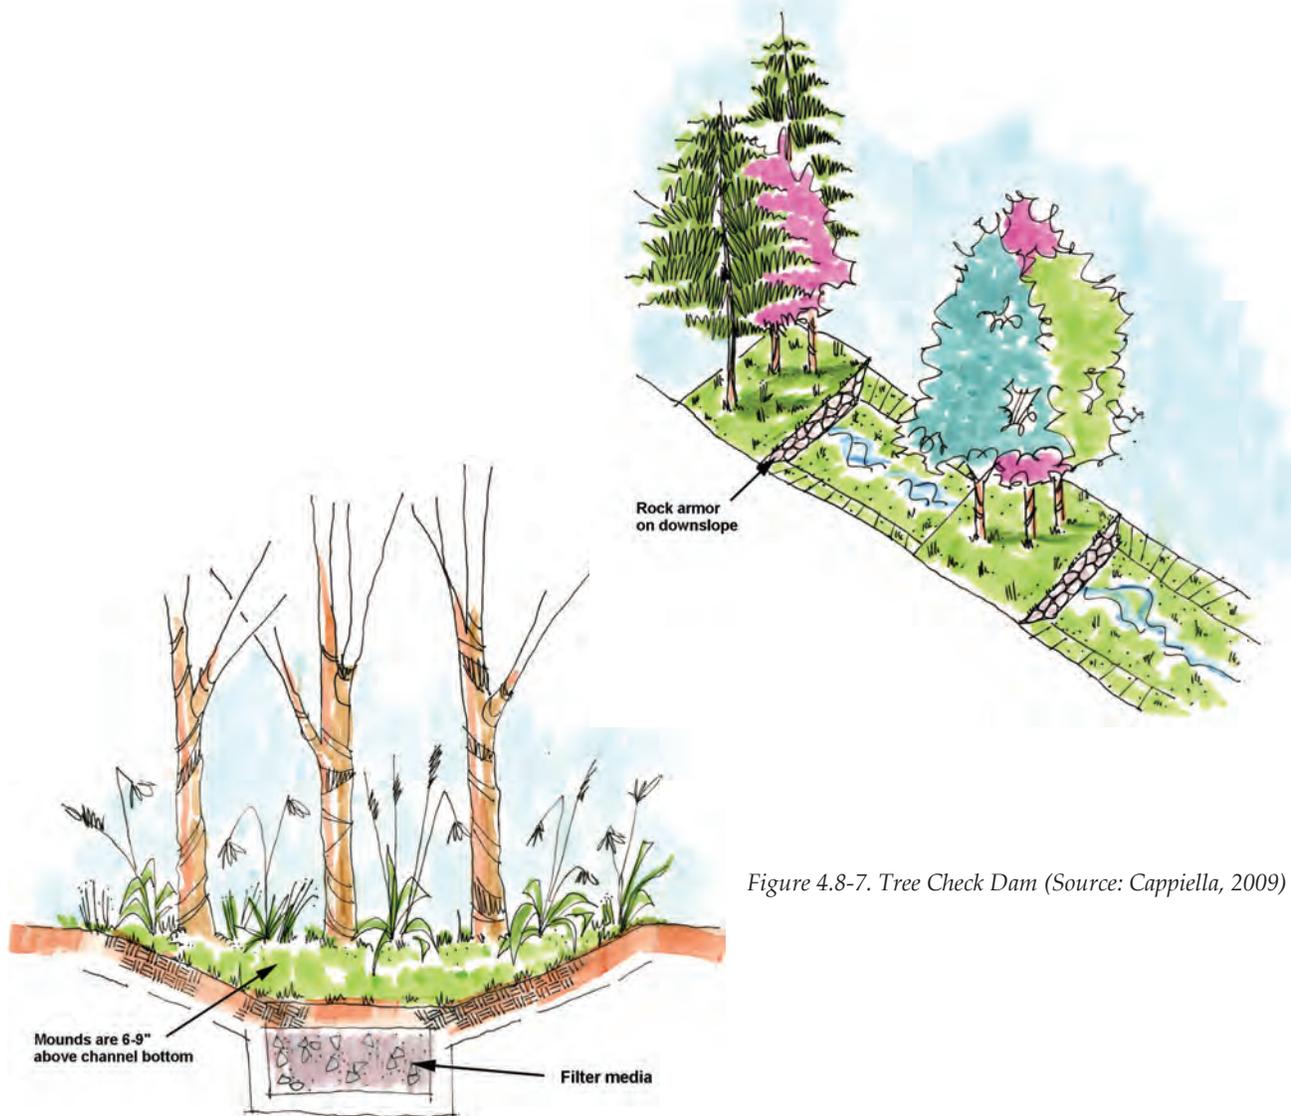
Tree Check Dam (Source: Cappiella, 2009)
